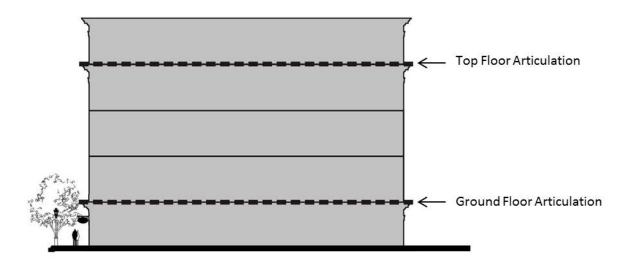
A.2: BUILDING HEIGHT ARTICULATION
